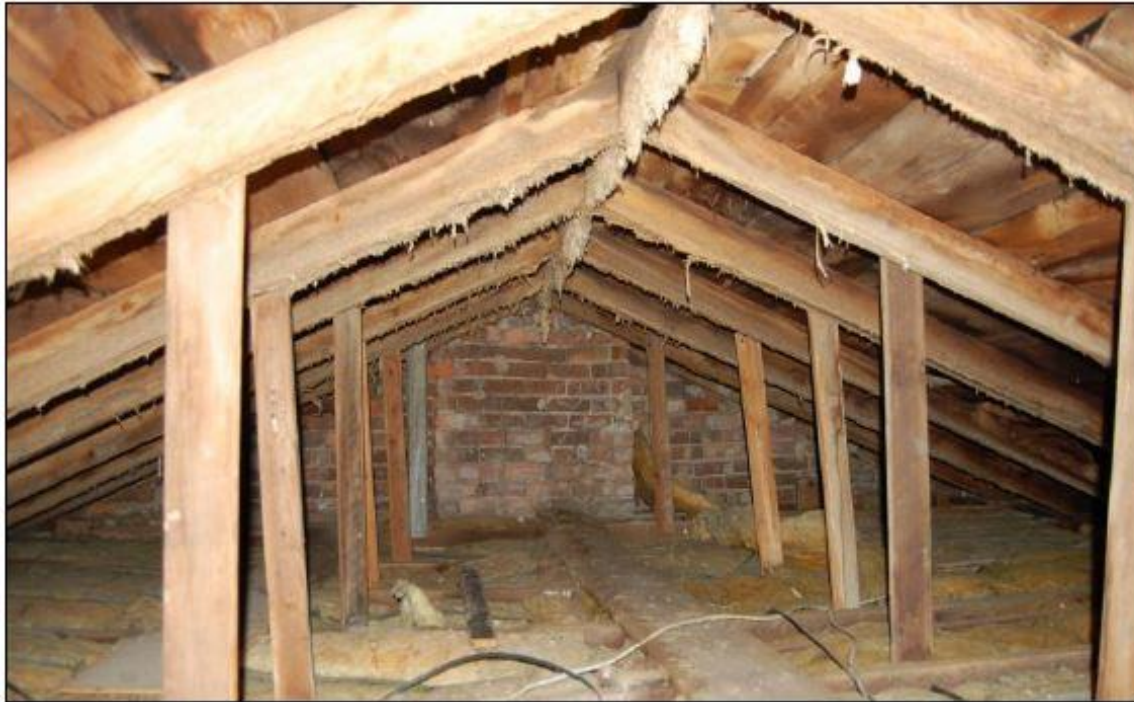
Bowman-Hite's common rafter system with ridgeboard, something typically found in later-19th century balloon frame structures. This system may have replaced the original roof during the ca. 1876-1880s alterations although this cannot be entirely confirmed. (Photograph by Michael Spencer, 2011)
